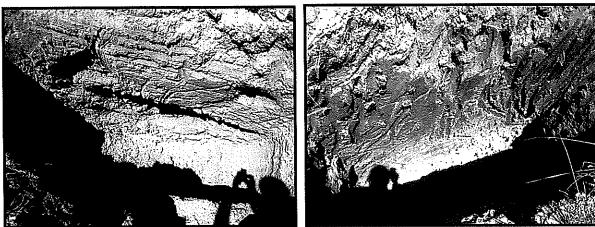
and Plate 3. The general soil profile observed at the proposed bridge site.
